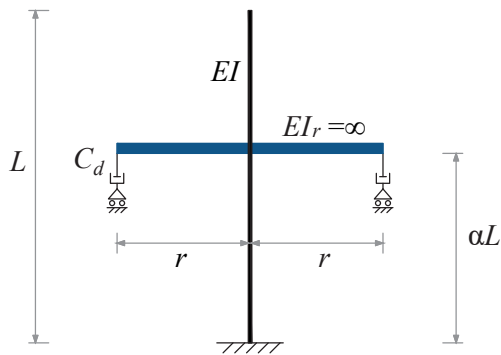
Cantilever beam with damped outriggers. Adapted from Chen *et al.* (2010)
